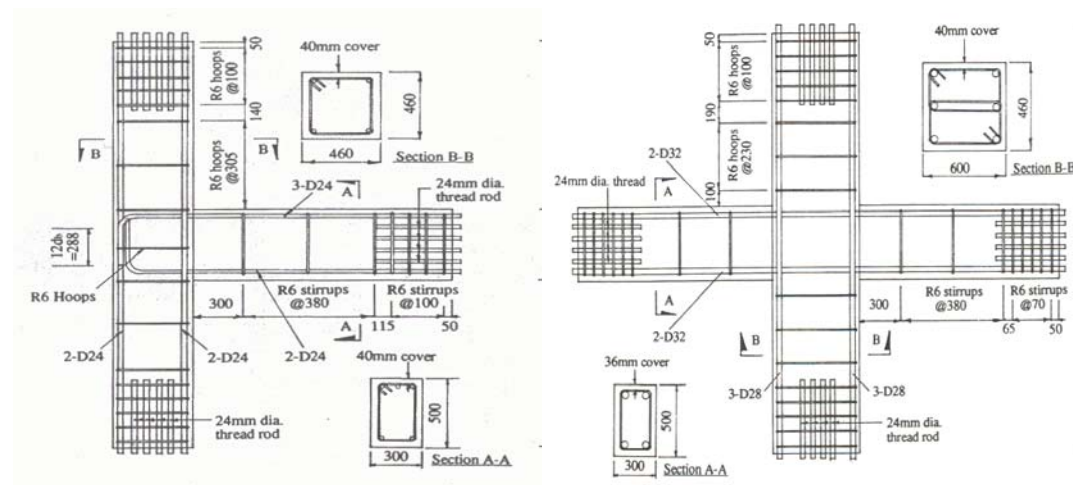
Typical pre-1970s reinforced concrete beam-column joint in New Zealand, Hakuto (1995)
